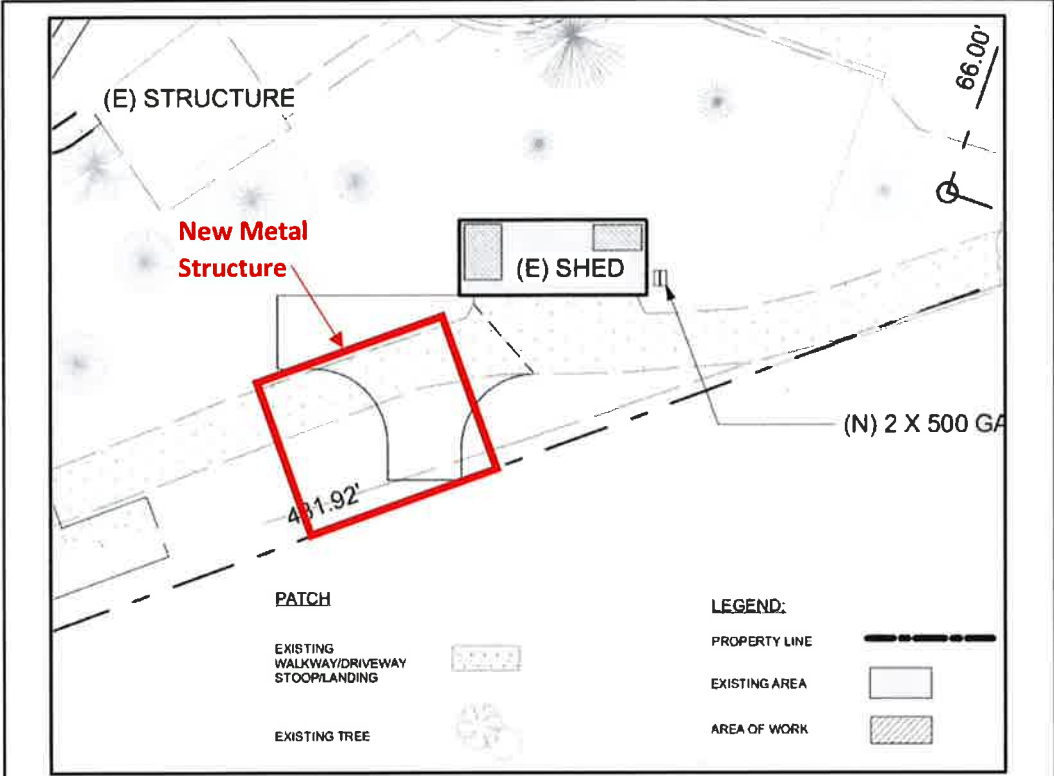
Excerpt of IS/MND Figure 3 Detailed Site Plan
